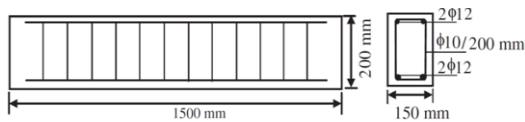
Geometric specifications and steel reinforcement details of beams (FEM beams)
